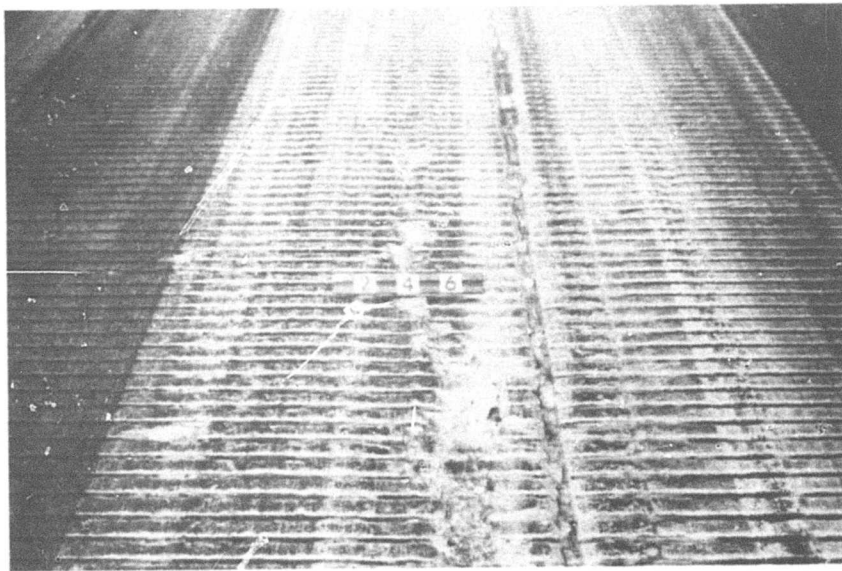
Chicago Midway Airport -- Spalling along center longitudinal joint of runway.
